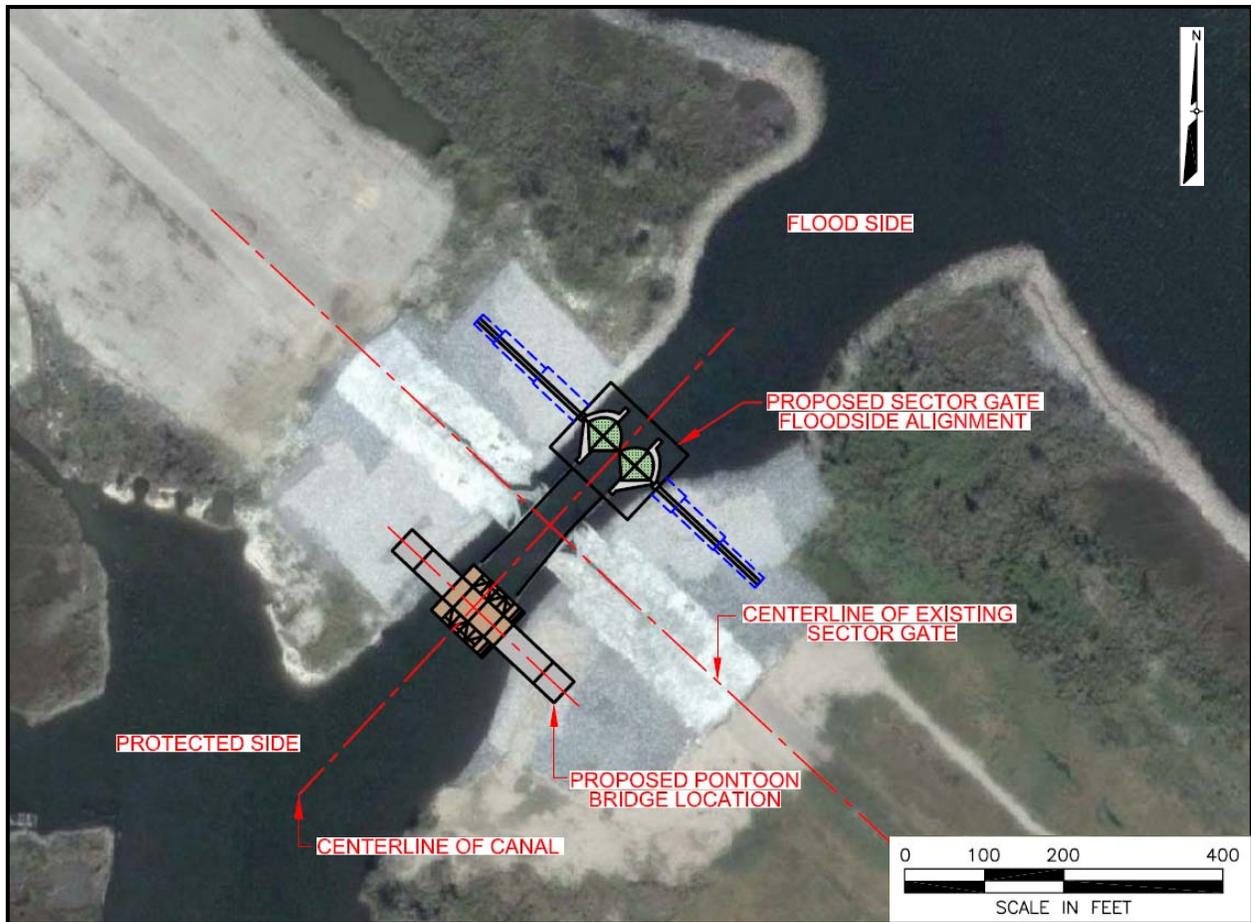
Schematic of the Proposed Action – Sector Gate and Pontoon Bridge
